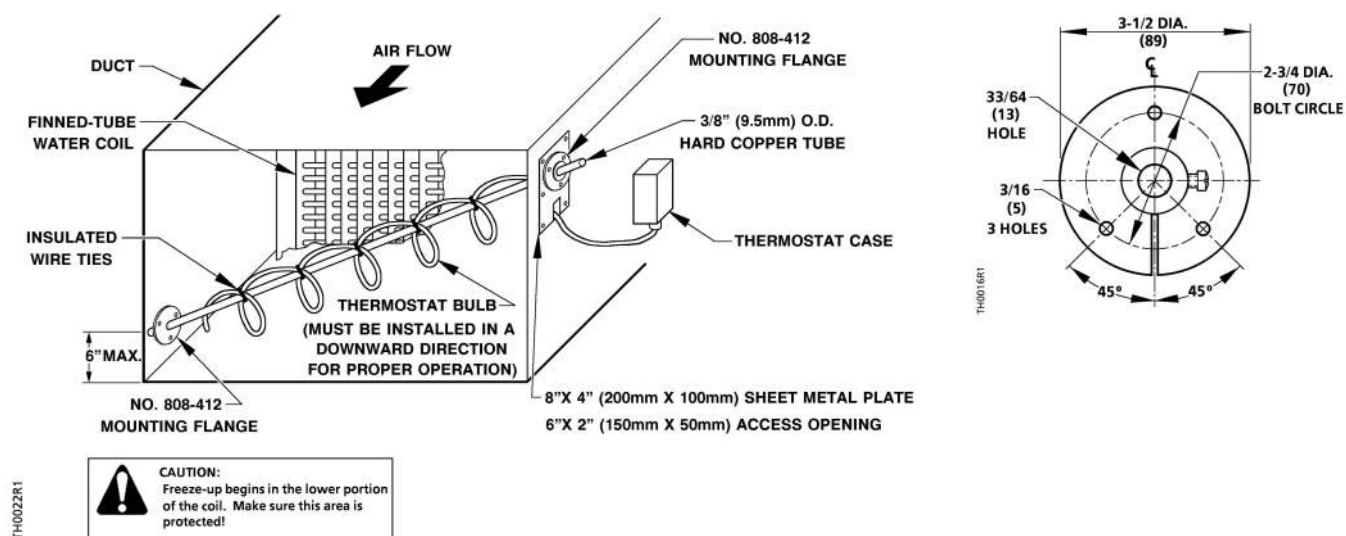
Bulb Mounting for Limited Access Ducts with 808-412 Mounting Flange.
